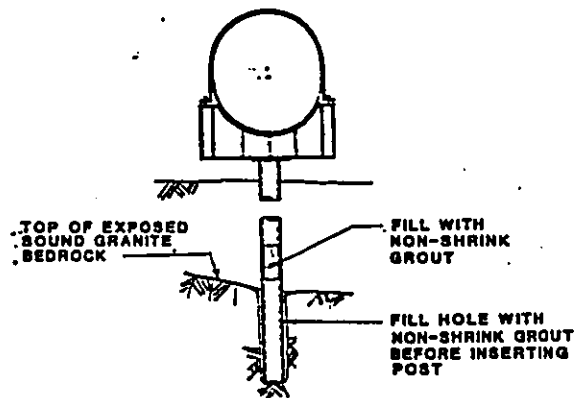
The typical cross-sections of the penstock to be used in the Upper
